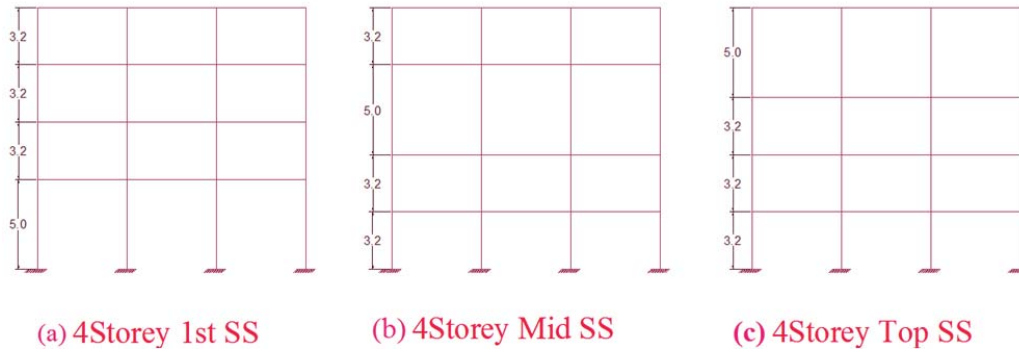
4-storey configuration, (a) SS at 1<sup>st</sup> floor (b) SS at middle floor (c) SS at last floor
